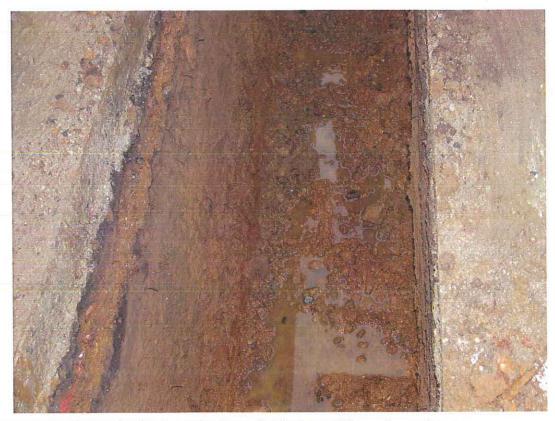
Looking south, showing natural gravel at the base of the north-south foundation trench (to west of the annexe building)
